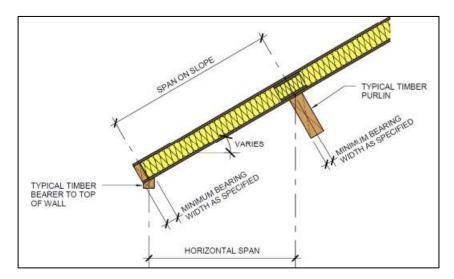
Indicative Section Detail for Roofs in Table 15 to Table 17
